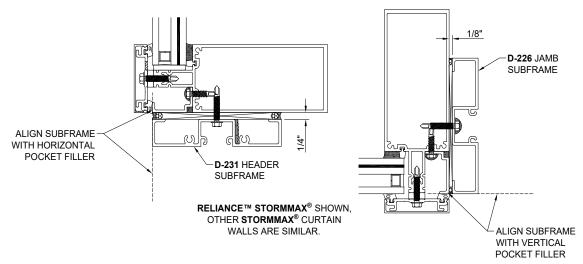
StormMax<sup>®</sup> Curtain Wall Subframe Alignment, Shimming and Sealing
